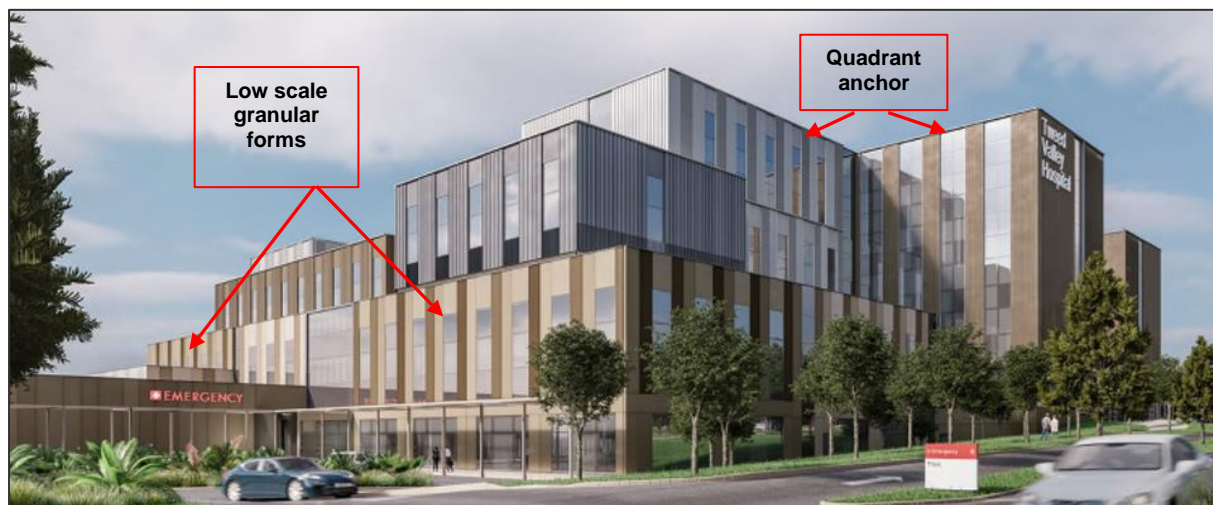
| Southwest corner of new hospital building and emergency entrance, demonstrating the variation in building modulation and façade materials (Source: Applicant's EIS)
